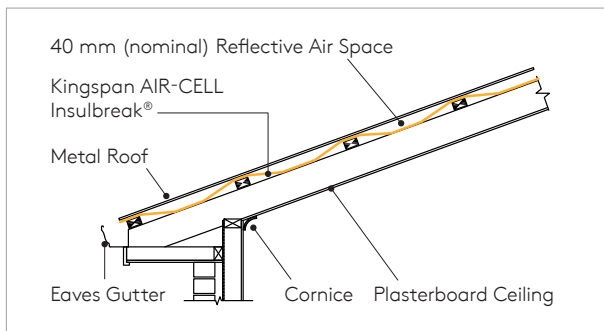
Side elevation of Kingspan AIR-CELL Insulbreak® in a metal roof with a raked ceiling.
